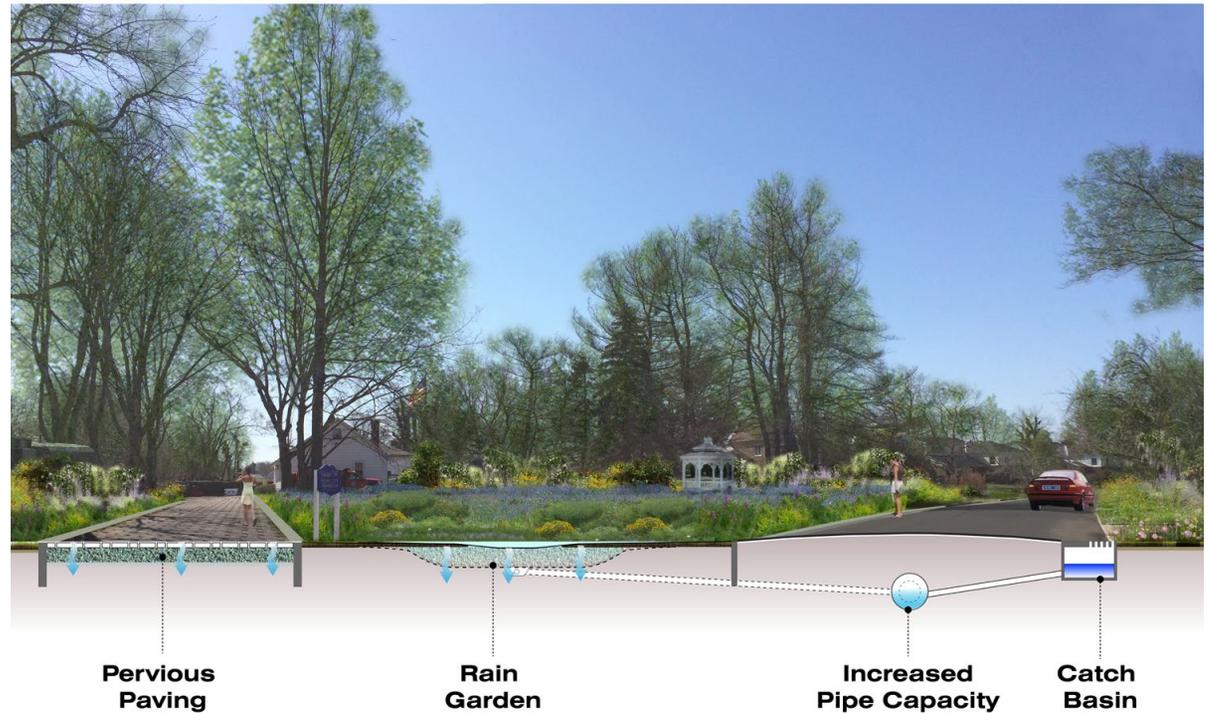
Hewlett Harbor Village Hall Stormwater Infrastructure Upgrades
